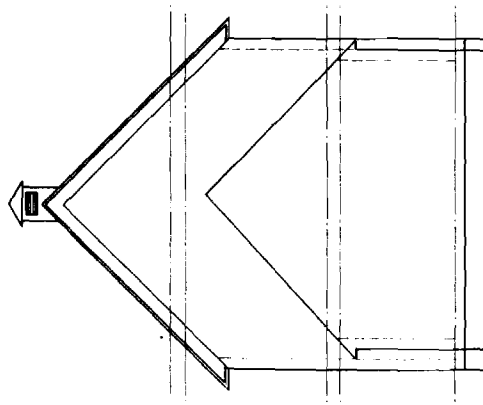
BUILDING No. 8 - TWO - STOREY SOLID BRICK SCHOOL WITH ONE - STOREY EXTENSION AT REAR
